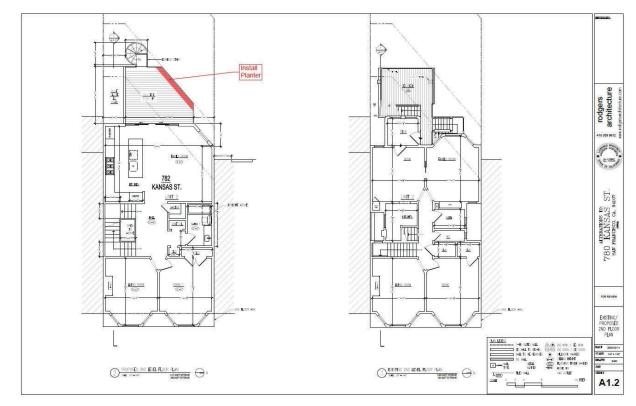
Fourth Set of Proposed Settlement Offer Revisions February 18, 2020 Revised 2nd Floor Plan -- Deck pulled back & planter added for privacy
